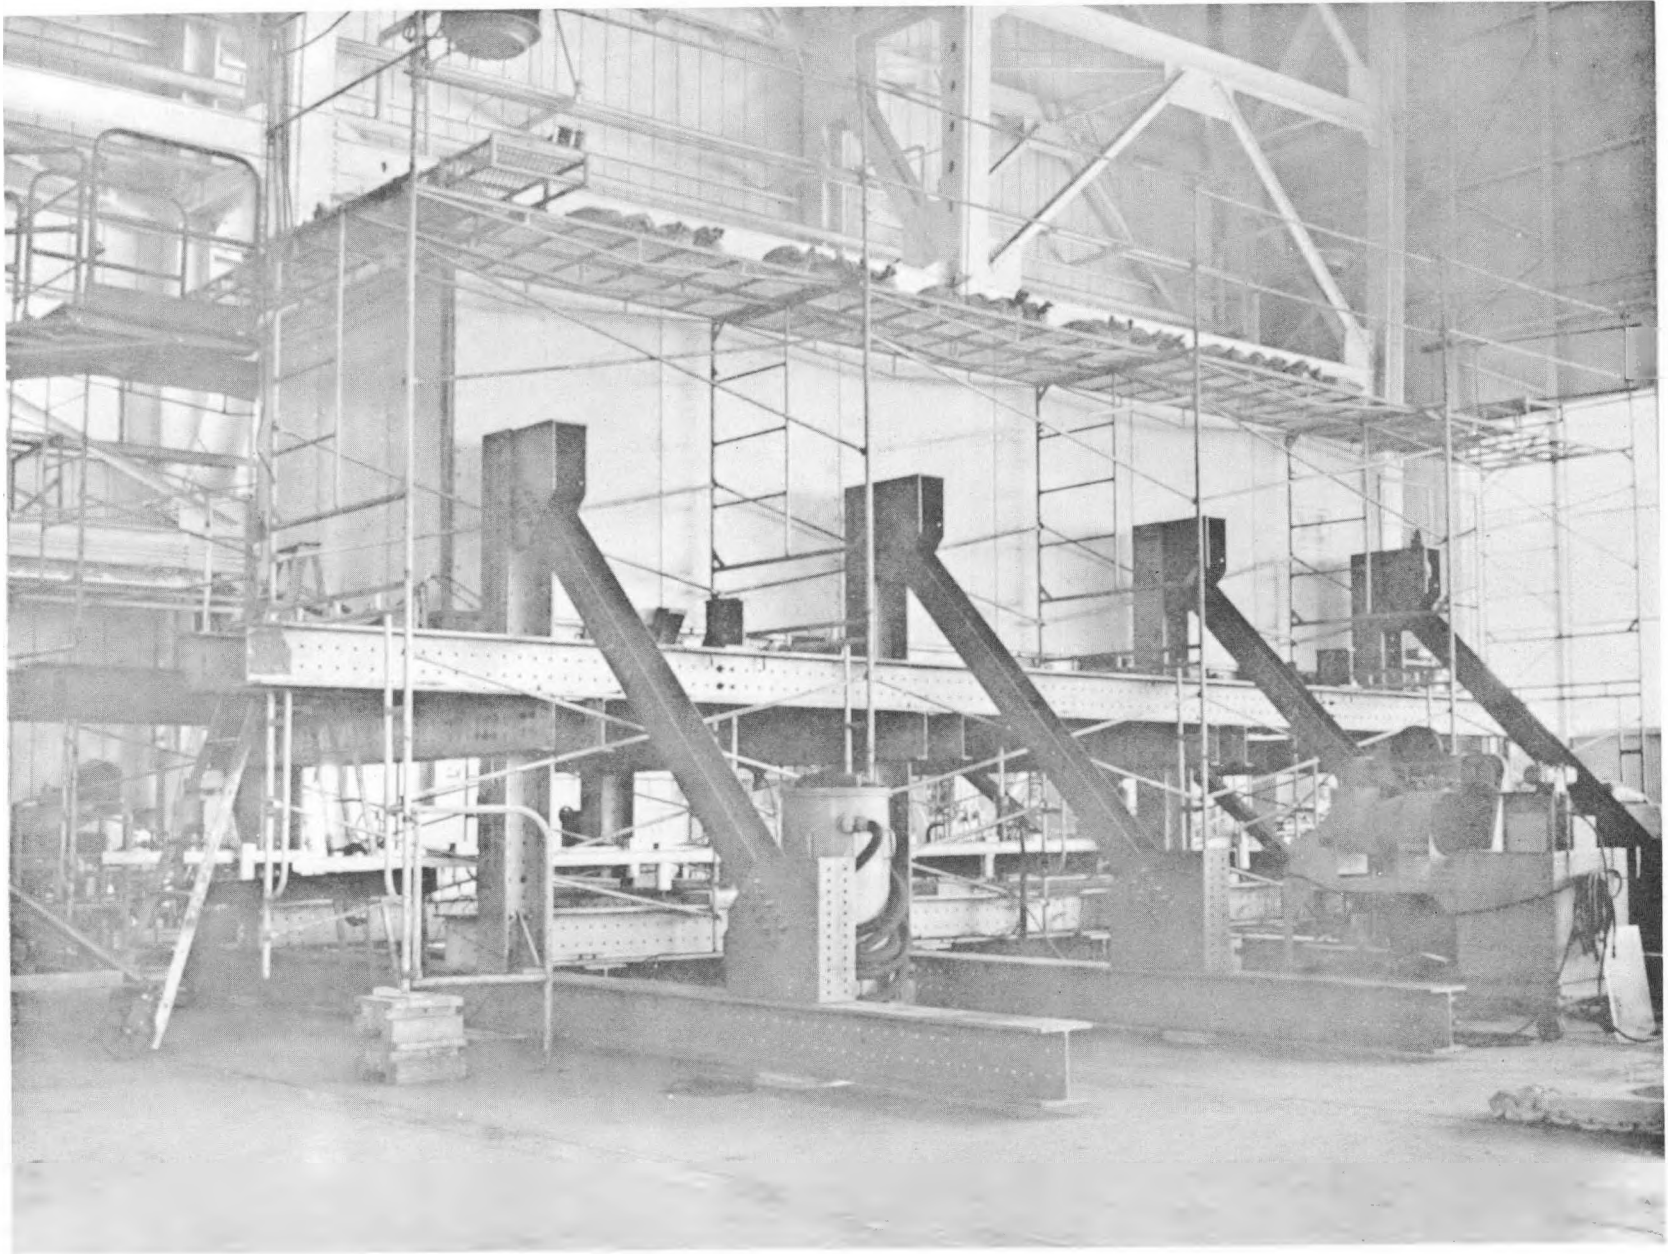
PM-1 Test Package End Support Condition--Overall View
